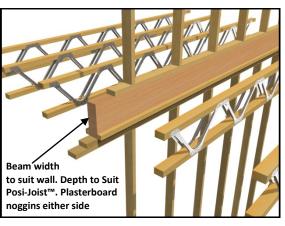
Posi-Joists™ Parallel to Internal Load Bearing Wall
